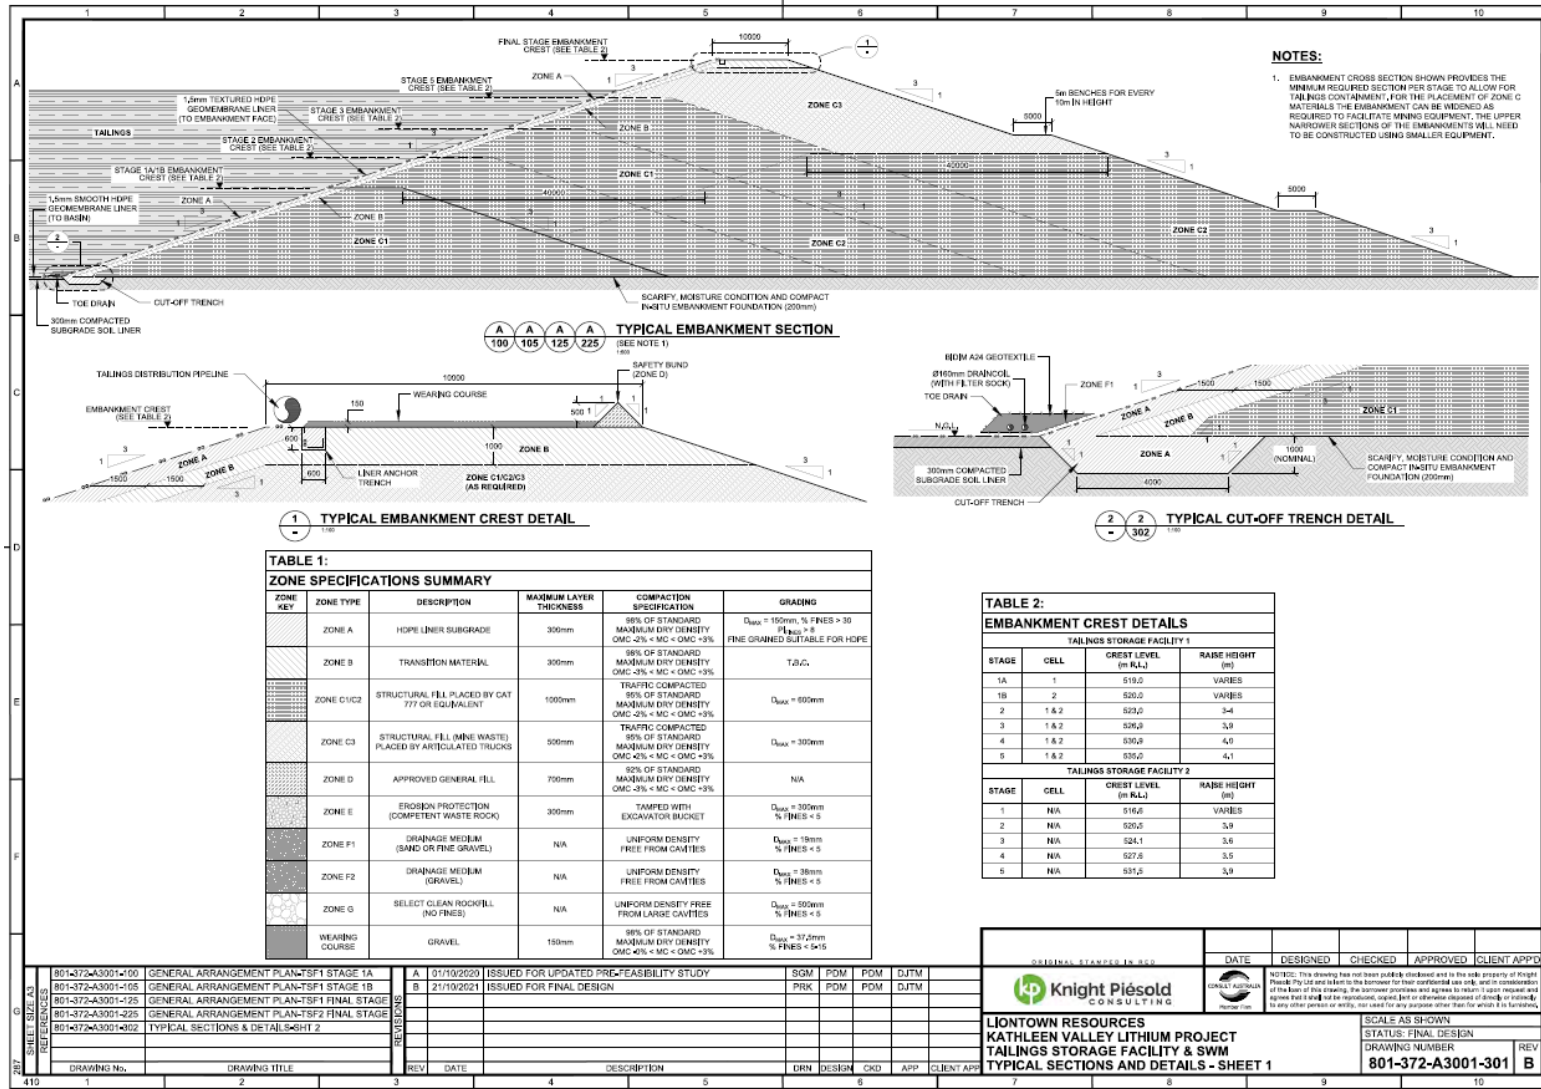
Tailings Storage Facility Typical Section Detail – 801-372-A3001-301
